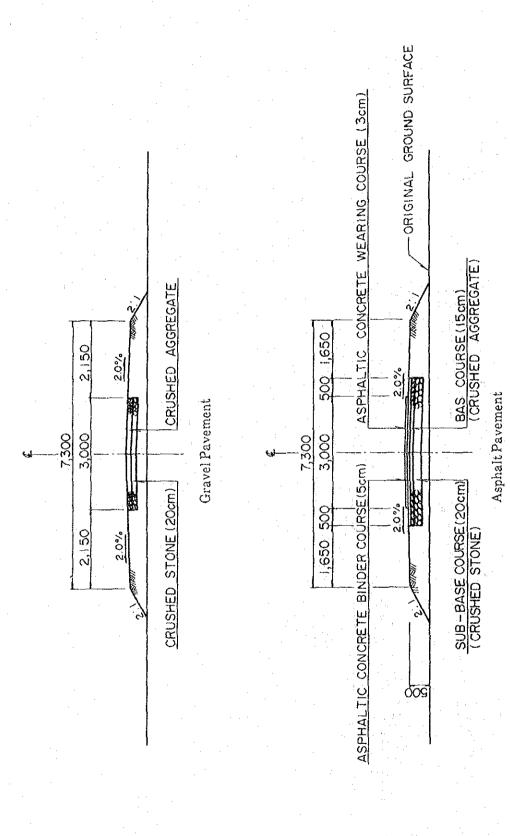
TYPICAL CROSS SECTION OF ROAD
